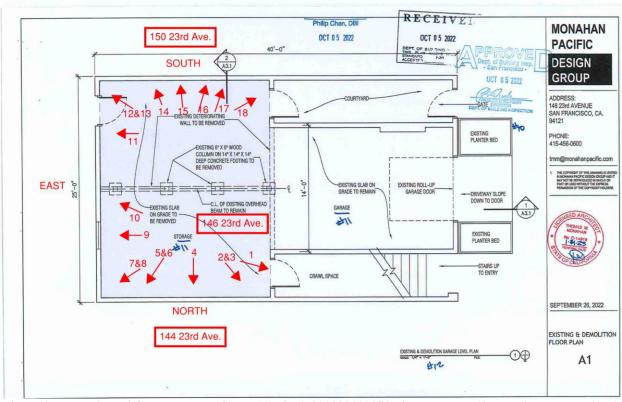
Plan View of Ground Floor (Sheet A1 of PA 202209132353) & Photo Key (Approximate Locations)
